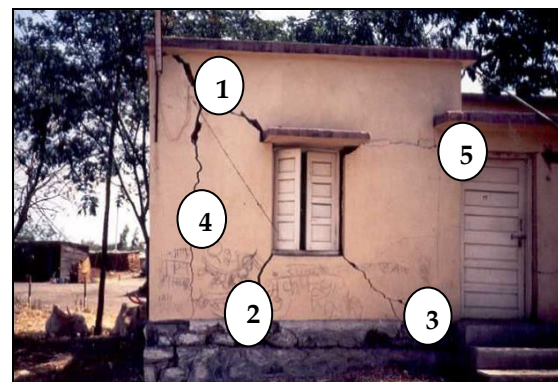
Typical Earthquake Damage - Sliding Failure of Roof-Wall Connection Due to the Absence of Wall Reinforcement (1993 Killari earthquake) (EERI, World Encyclopedia report, India, 6-5-2002)
